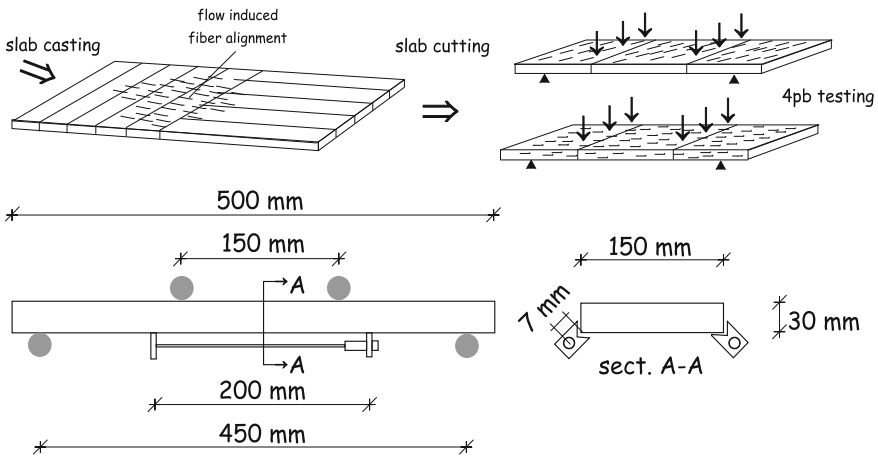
Slab casting scheme and beam specimen cutting and test set-up
